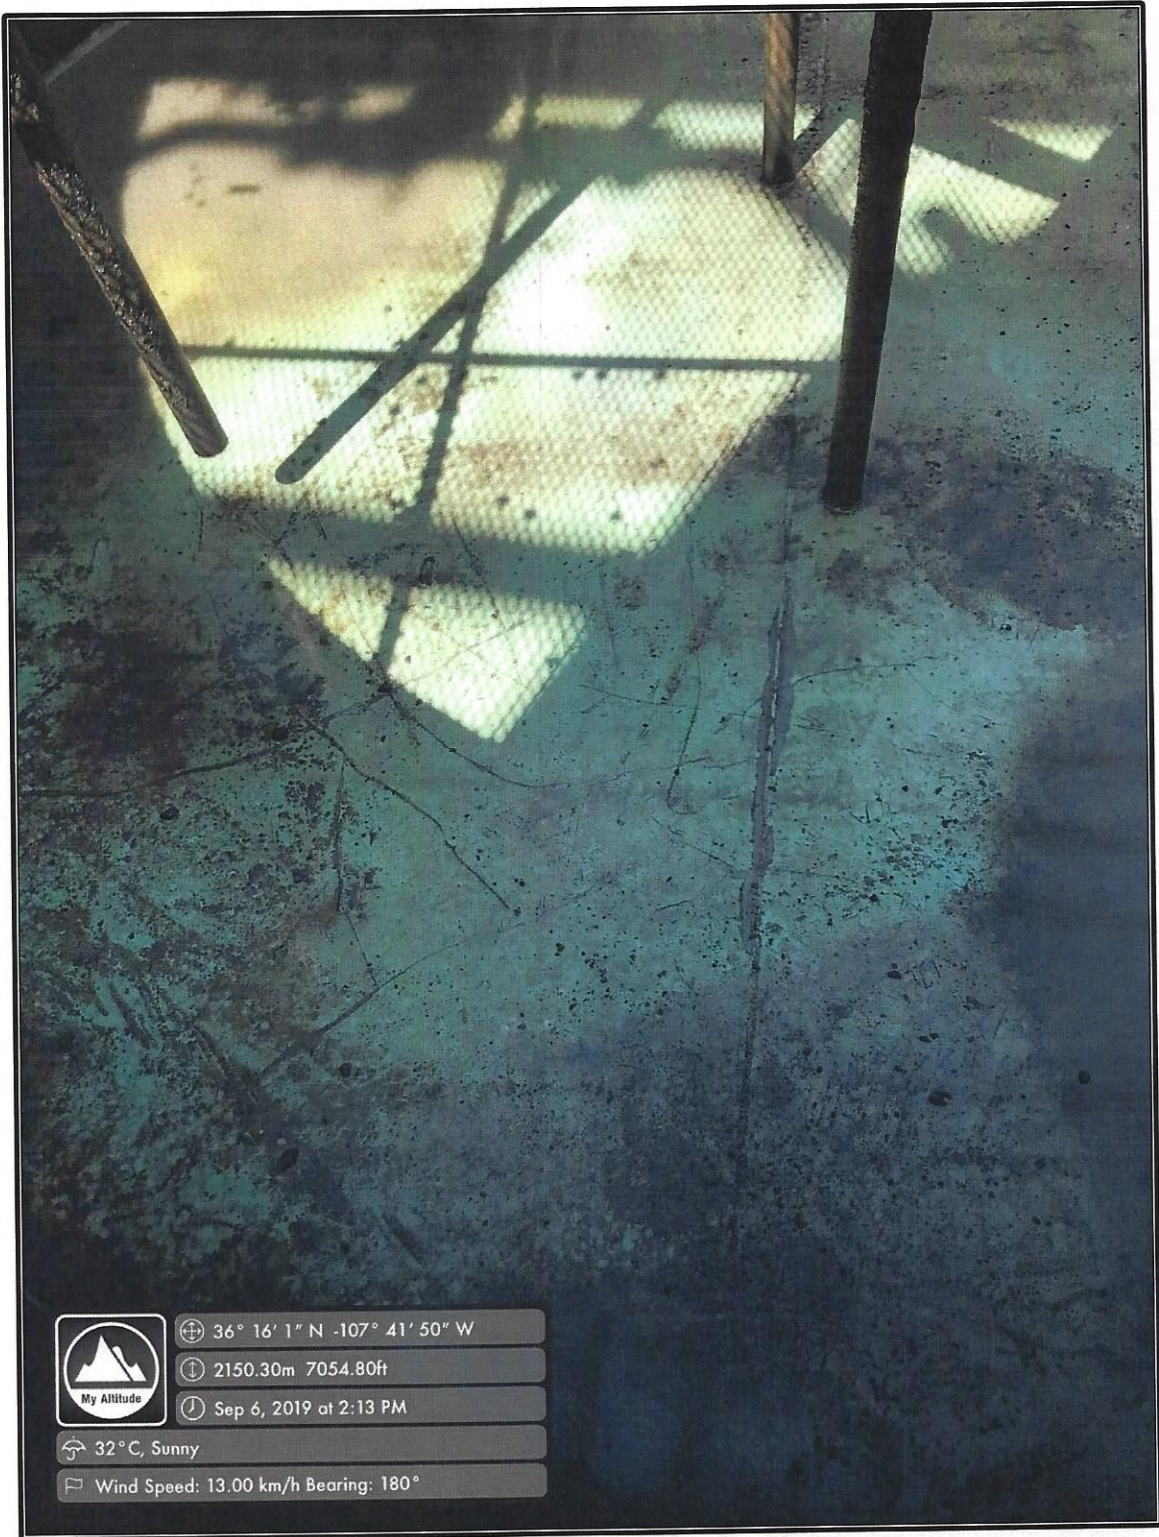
Picture of Pit Tank After Clean-Out (View 2)
